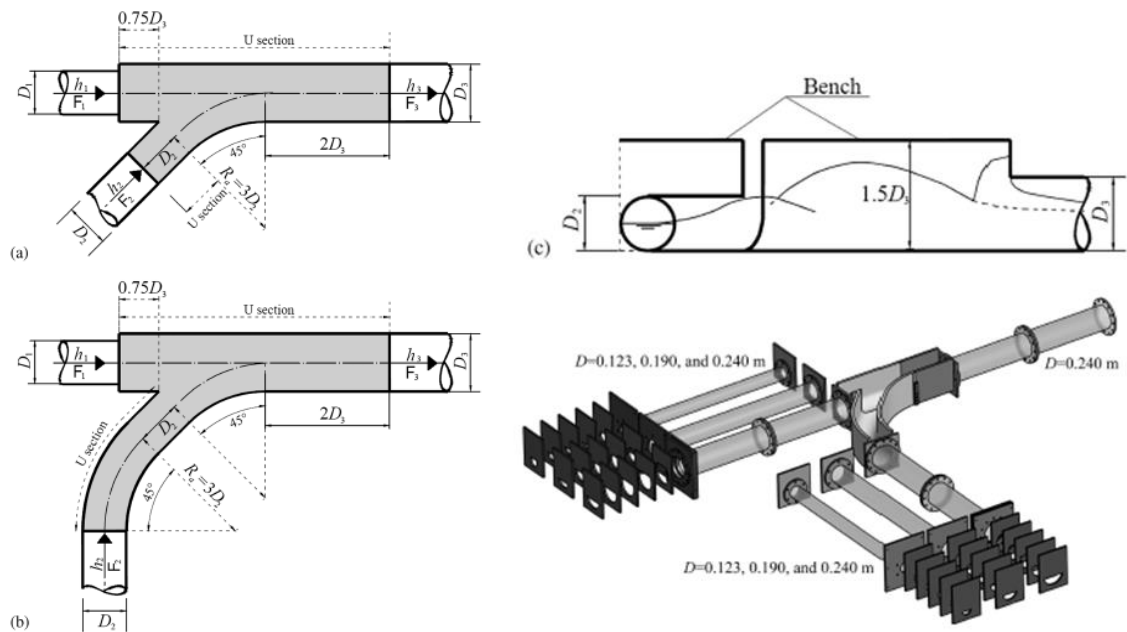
Scheme of the junction manhole: (a) plan view for 45 °, (b) plan view for 90 ° (c) section and overview of the model including jet boxes, conduits and junction, (Pfister and Gissoni, 2014).
